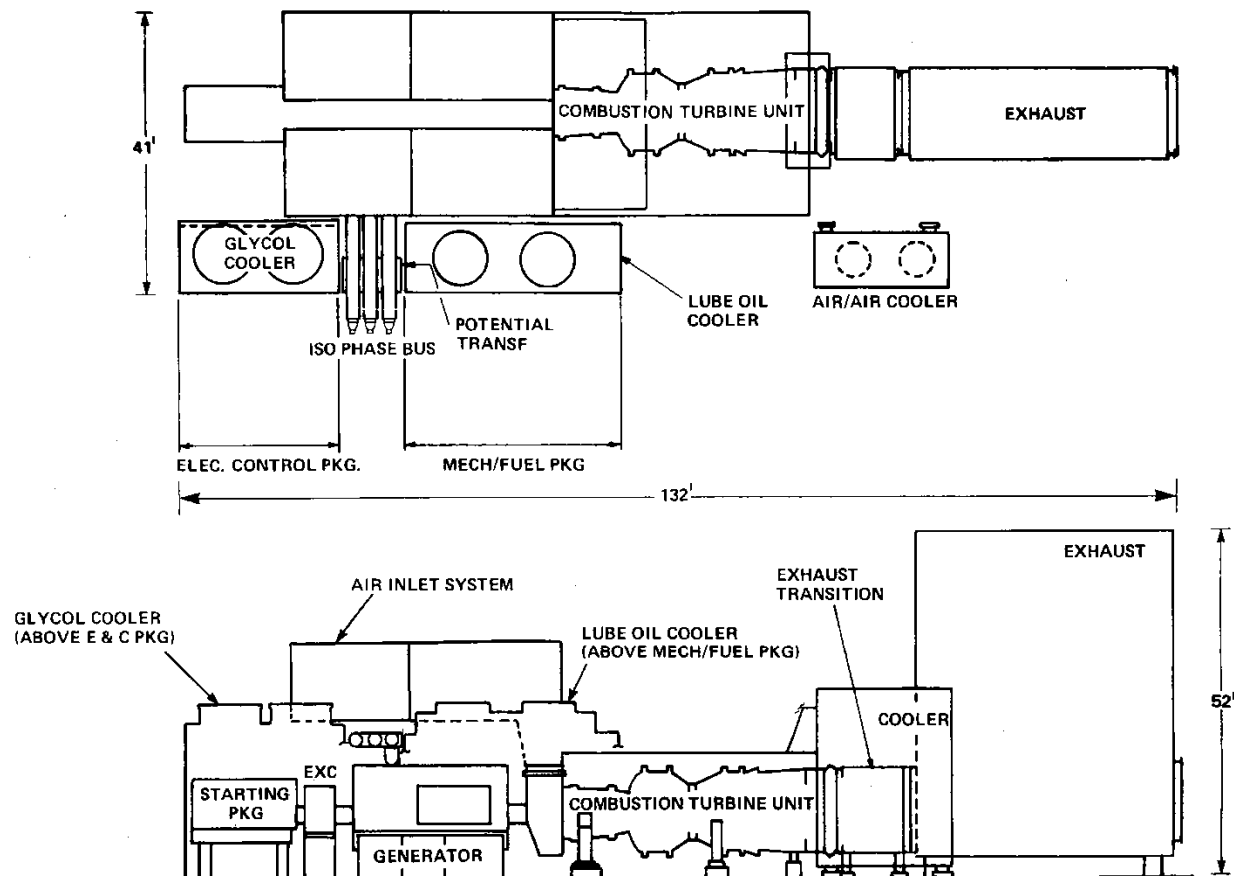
Top and Side-View of W-501 ECONO-PAC Power Plant Arrangement
